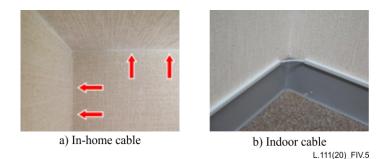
Examples of installation in the corner of a room; (a) in-home cable and (b) indoor cable
